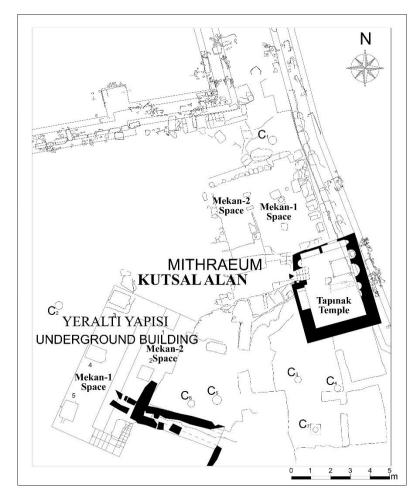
Plan of Mithraeum Complex, Zerzevan. (Zerzevan Excavation Archive)
